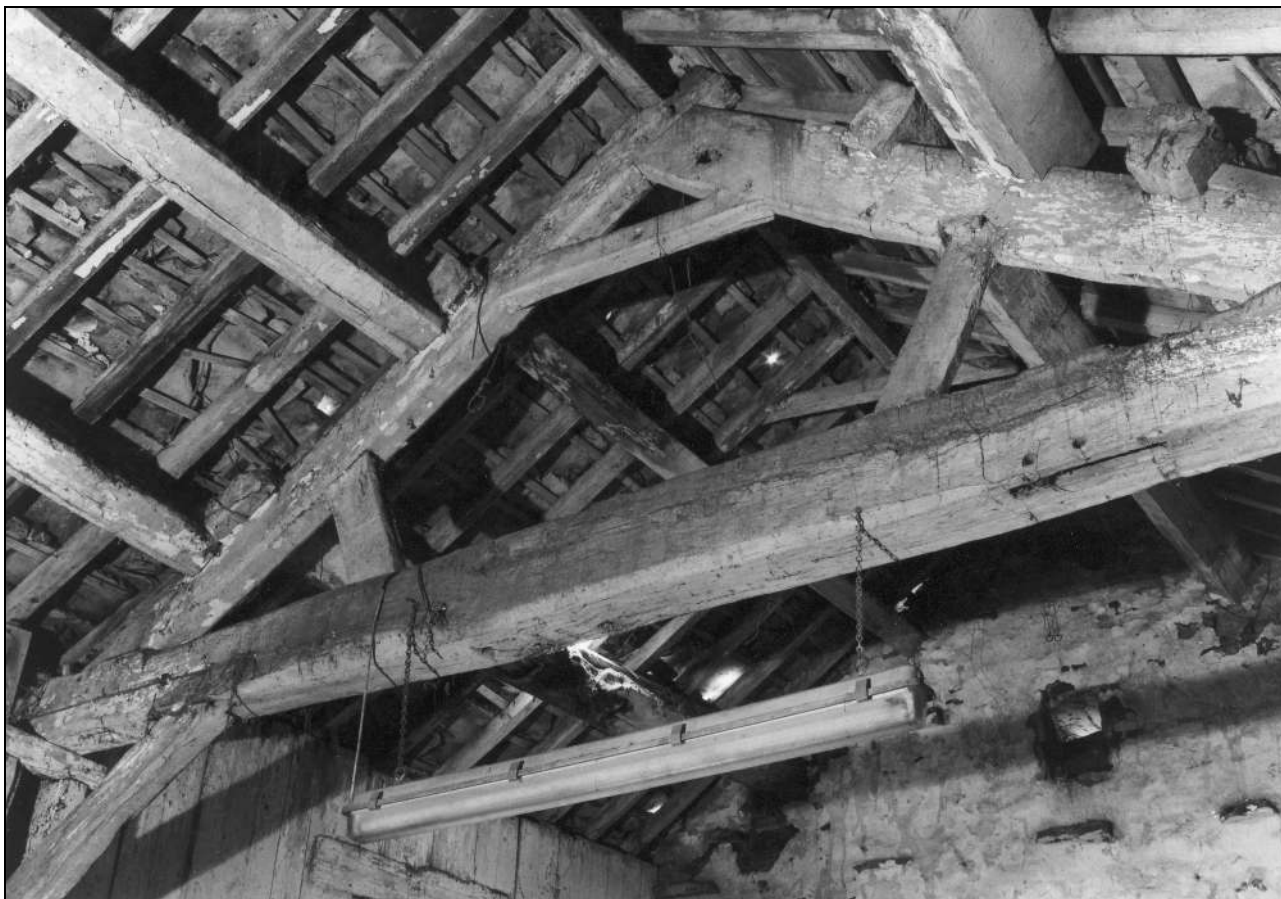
West roof truss, from the north-east (film 4, frame 10)
